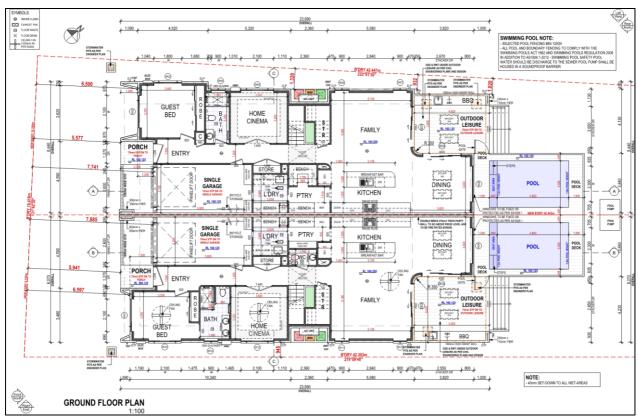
Proposed Ground Floor Plan (Source: VD&D, 2025)
